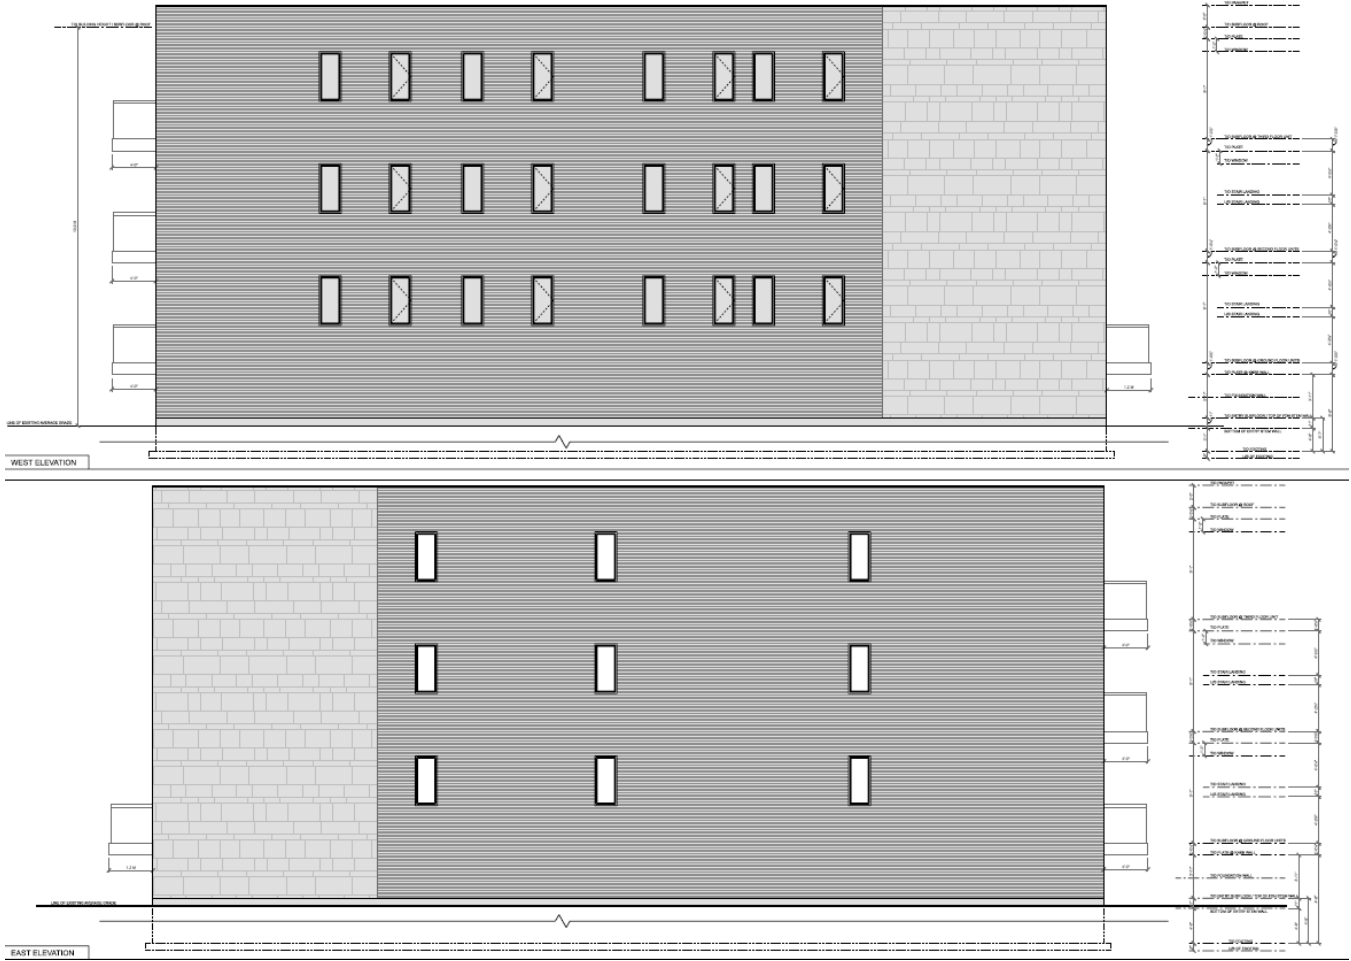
West (top) and East (bottom) Elevations of proposed building.
